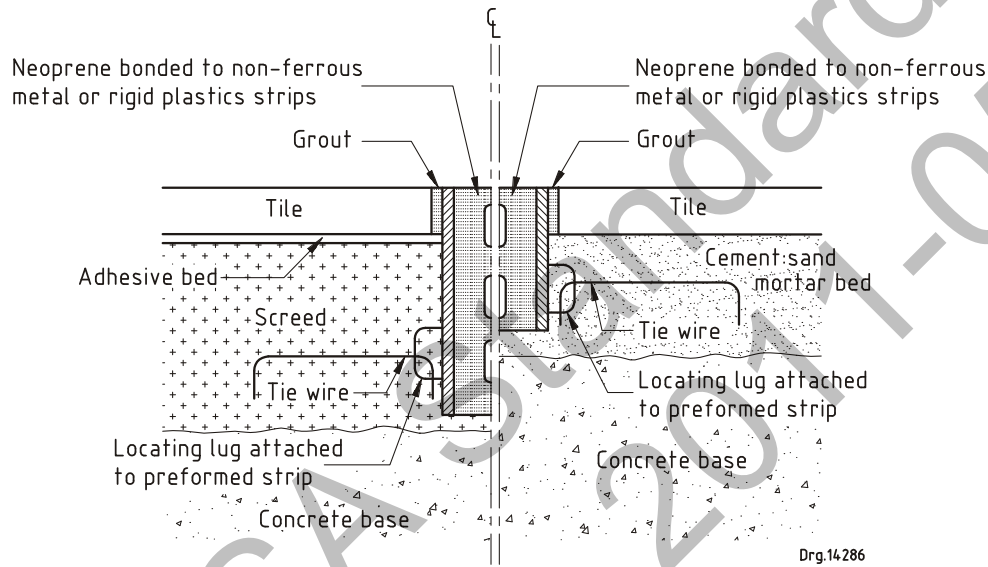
Type C — Flexible joint in bed, with or without separating layer
